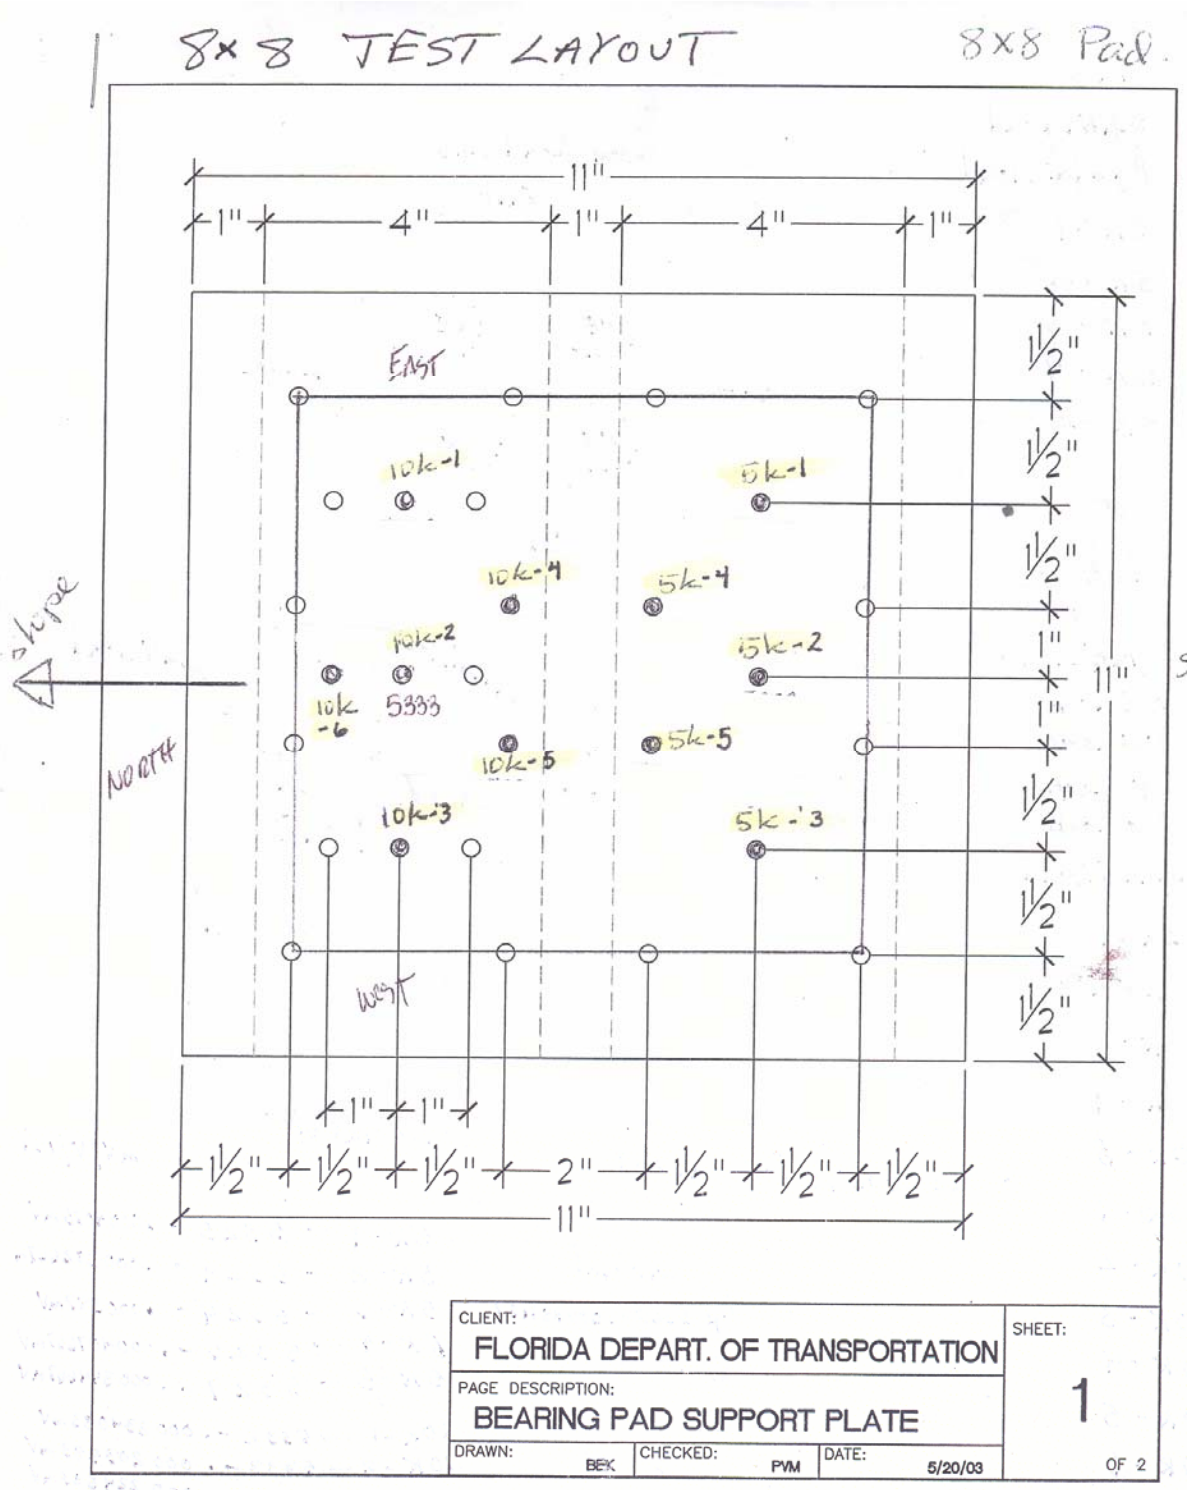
Pressure Gage Set-up for a 8x8 Bearing Pad
